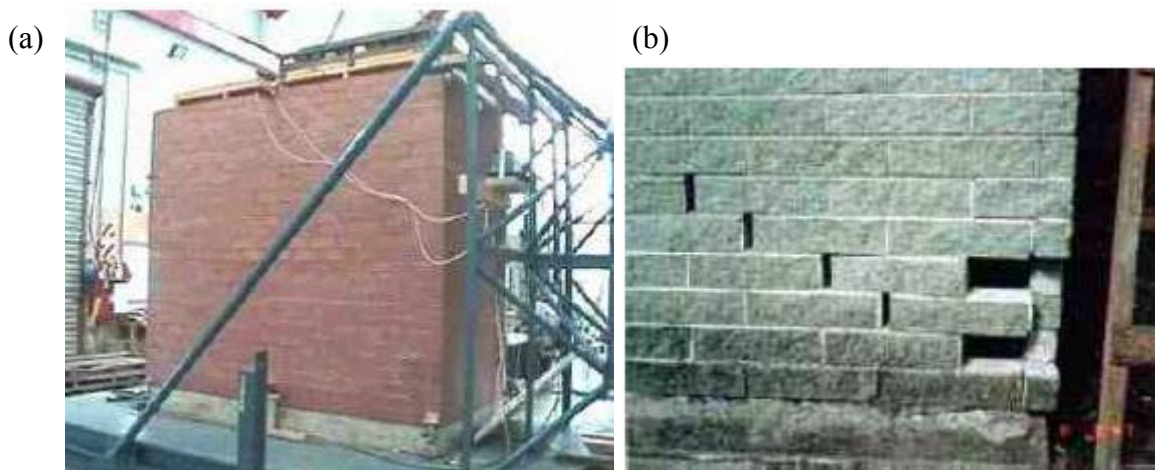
Experimental test setup and brick veneer corner failure observations by Beattie (2004).
